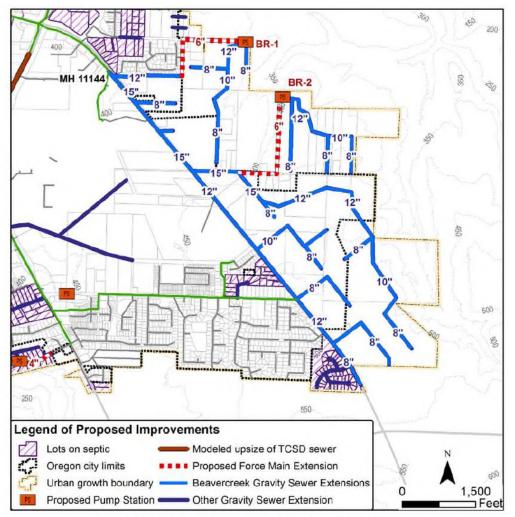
Figure 5-4 from the Oregon City Sanitary Sewer Master Plan
